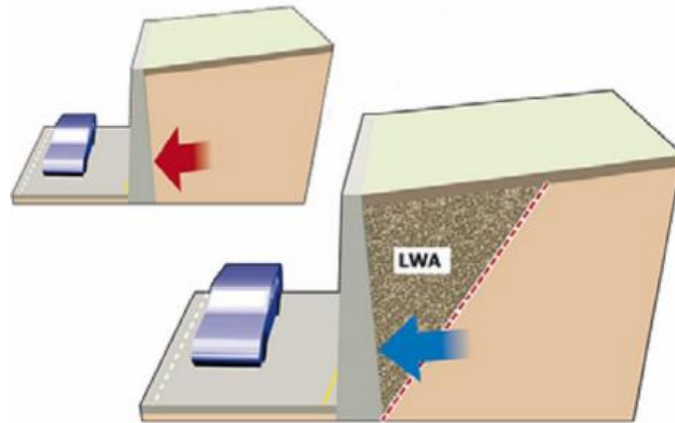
A Schematic Plan of Application of LECA on Reduction of Earth Thrust on Retaining Walls [13].
